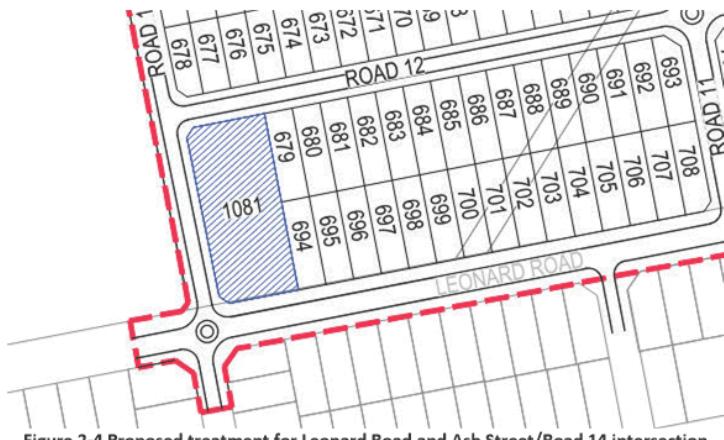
Proposed treatment for Leonard Road and Ash Street/Road 14 intersection
